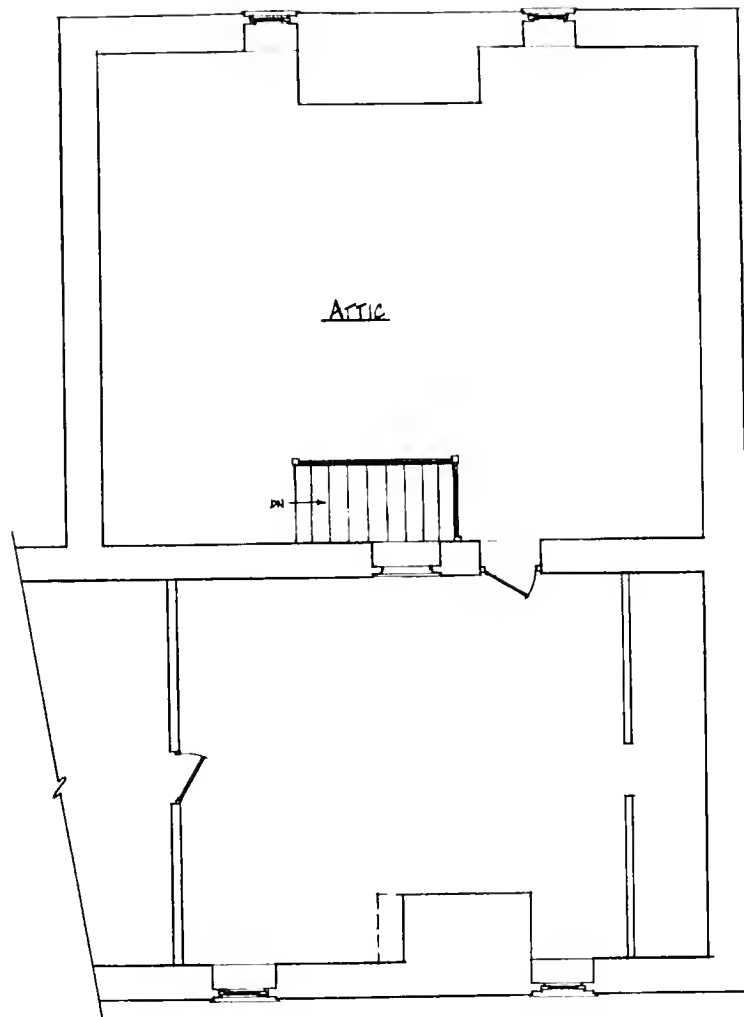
Mas Farlan House second floor plan (reflects design by R. Brugnard and Charles T. Okie; existing conditions measured and drawn by author)
